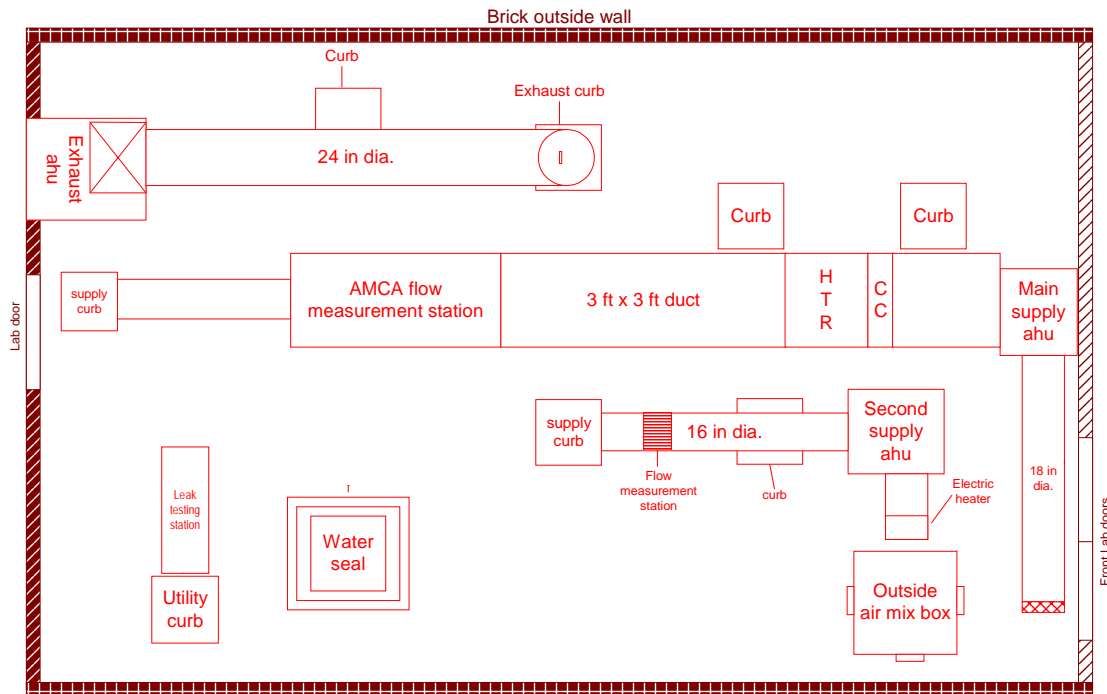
Plan View of the laboratory roof with all HVAC equipment.
